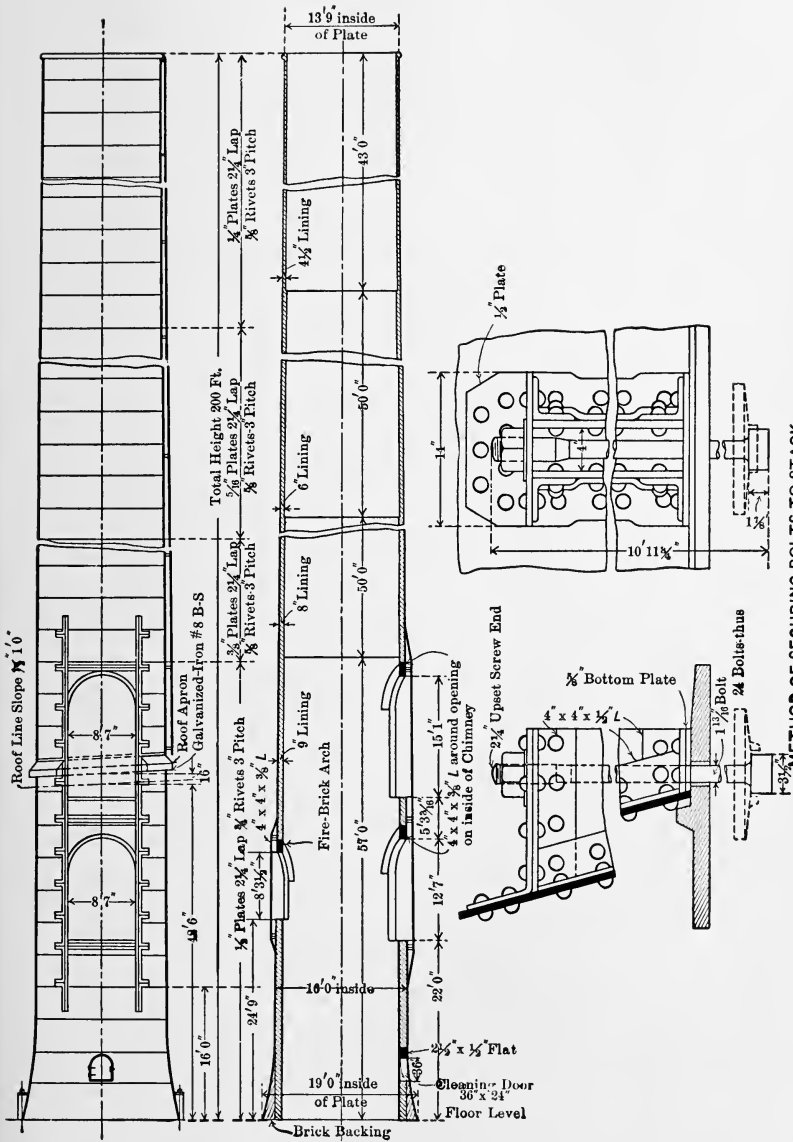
Steel Chimney of the South Side Elevated Railway Power House, Chicago.
